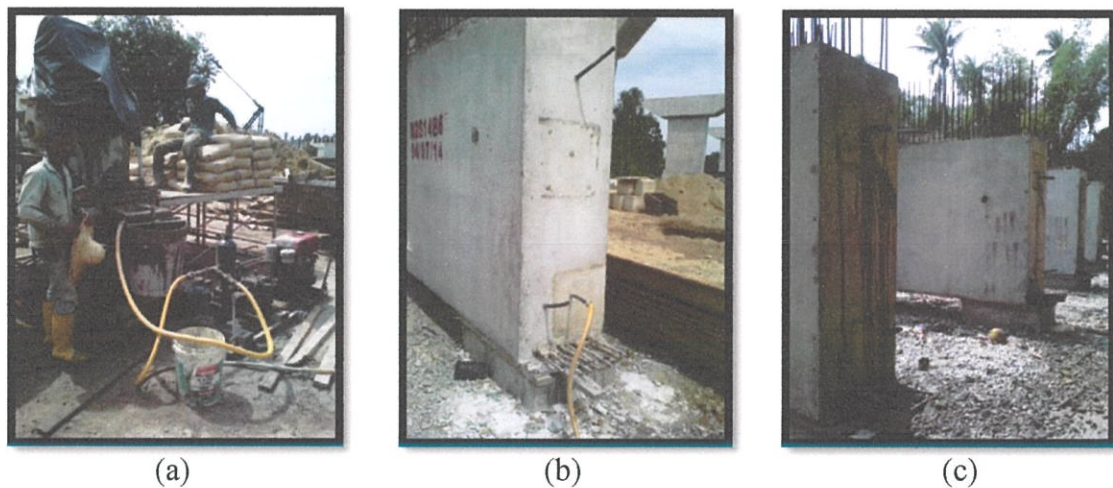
(a), (b), (c): Grouting Works for T Beam
